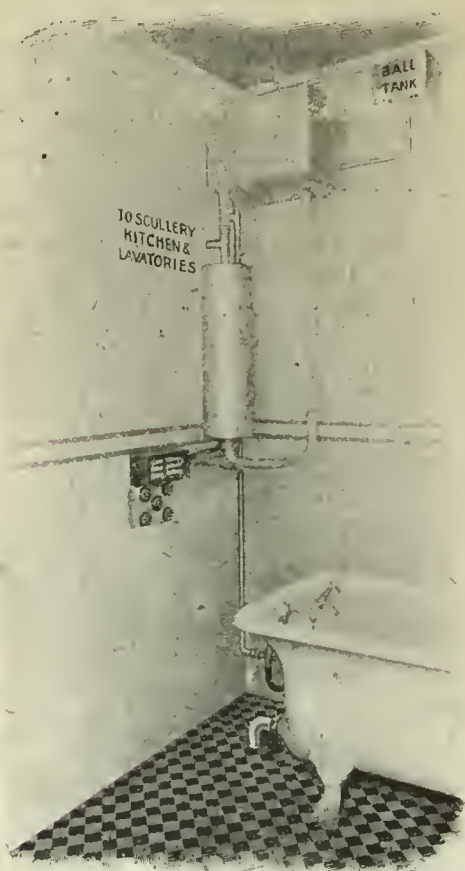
METHOD OF COUPLING THE "BELENUS" BOILER.
